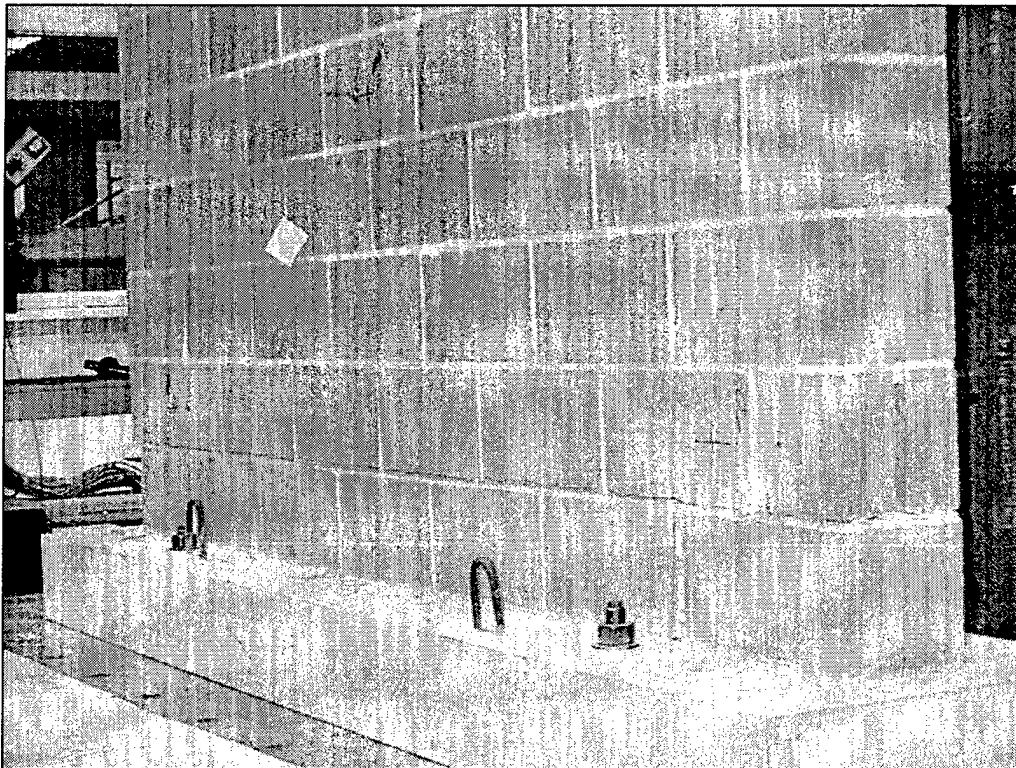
Formation of a crack on the outside of the unprotected wall from Seismic Test EQ-1, outside view.
